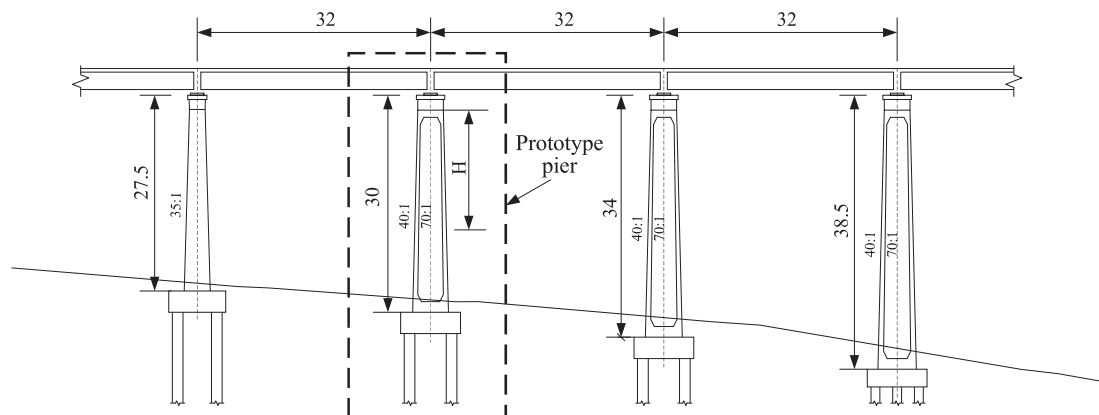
Prototype of a multispan simply supported bridge (unit: m).
